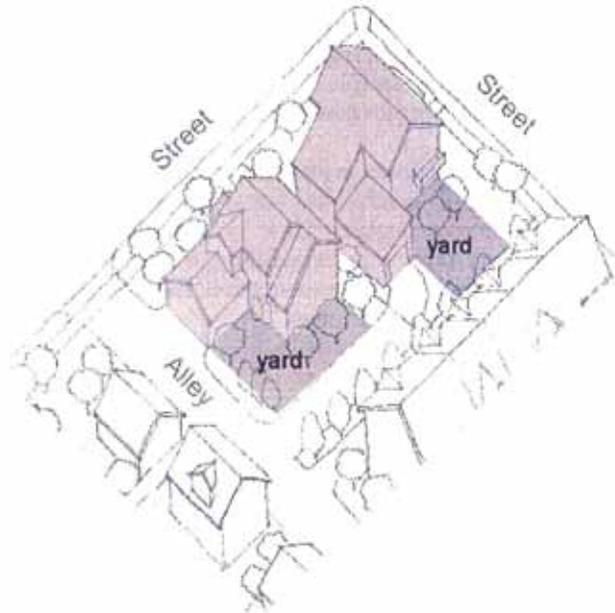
Private yard space must be provided for all detached single-family dwellings.
